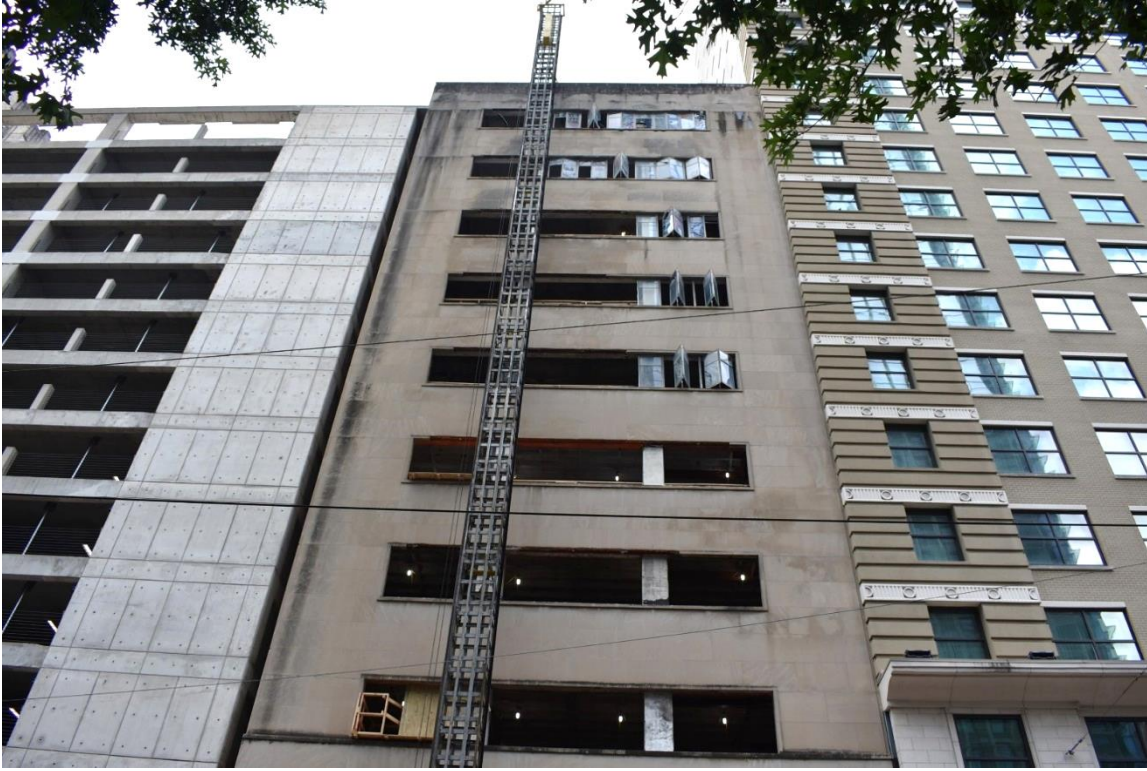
East elevation facing Main Street, upper floors exterior; view west.
